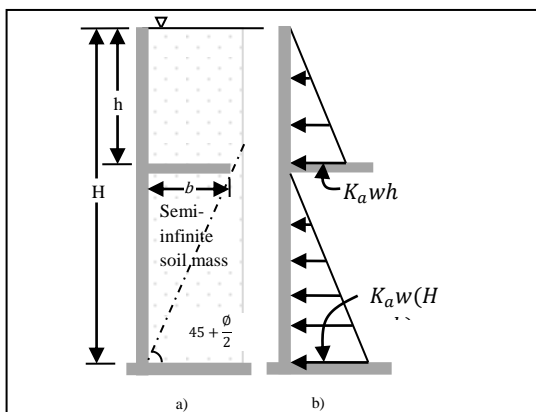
Stem of Cantilever type of retaining wall with shelf
